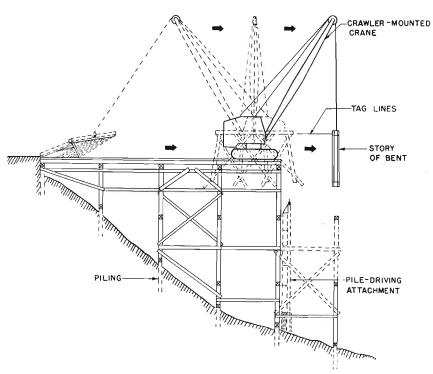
Crawler-mounted crane operating from deck of bridge to drive piles and erect timber towers within reach of crane.
